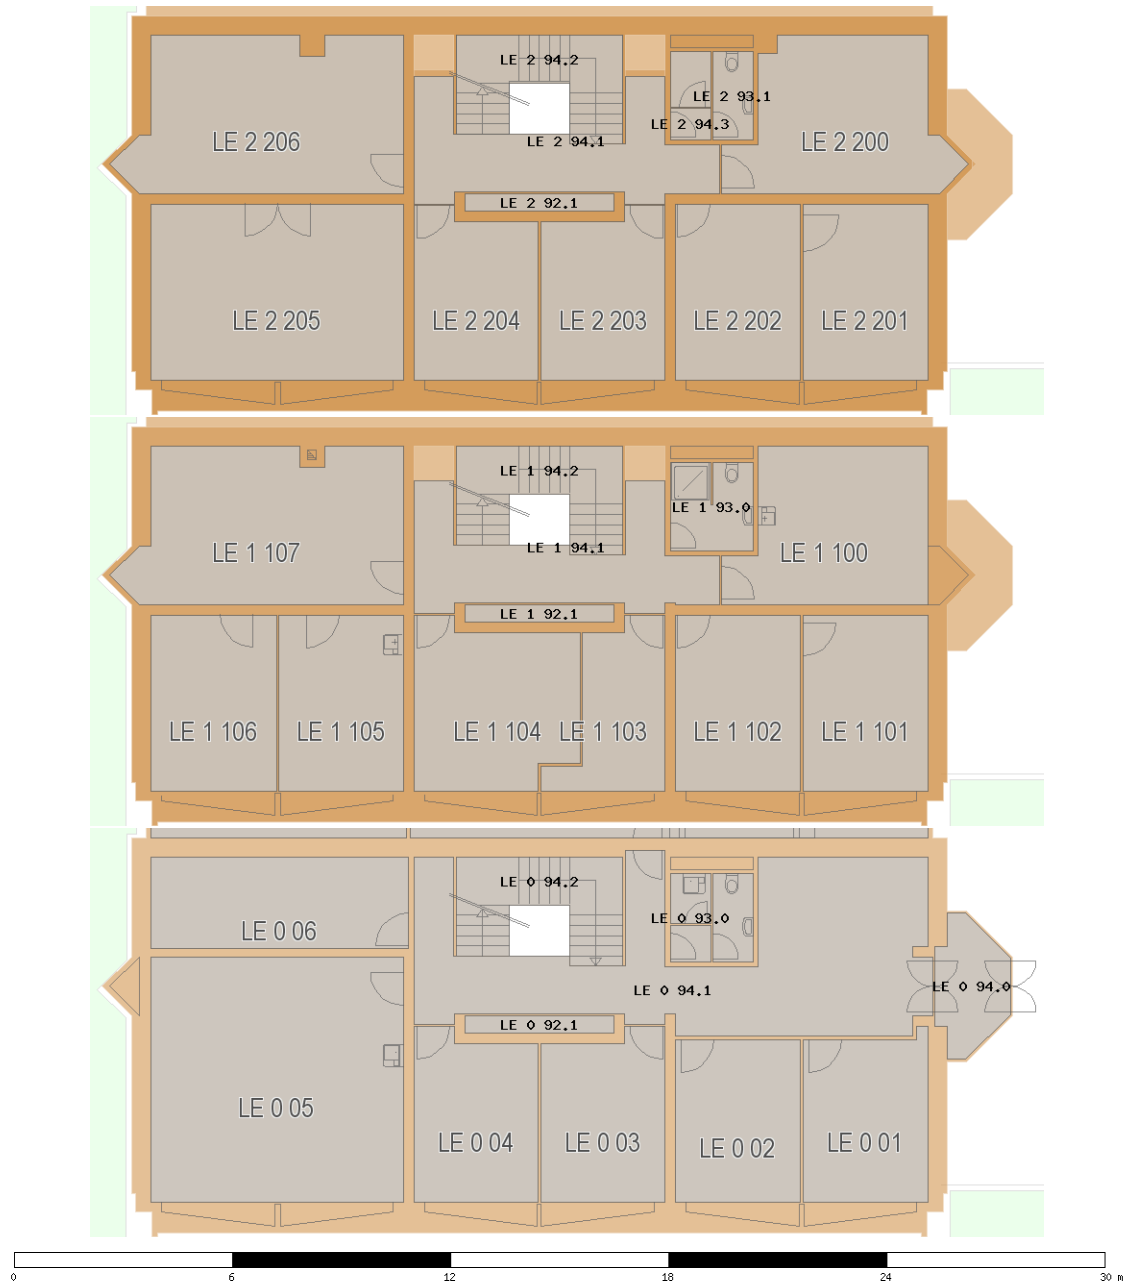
Floor drawings of the LESO building. (0: basement; 1: first floor; 2: second floor.)
